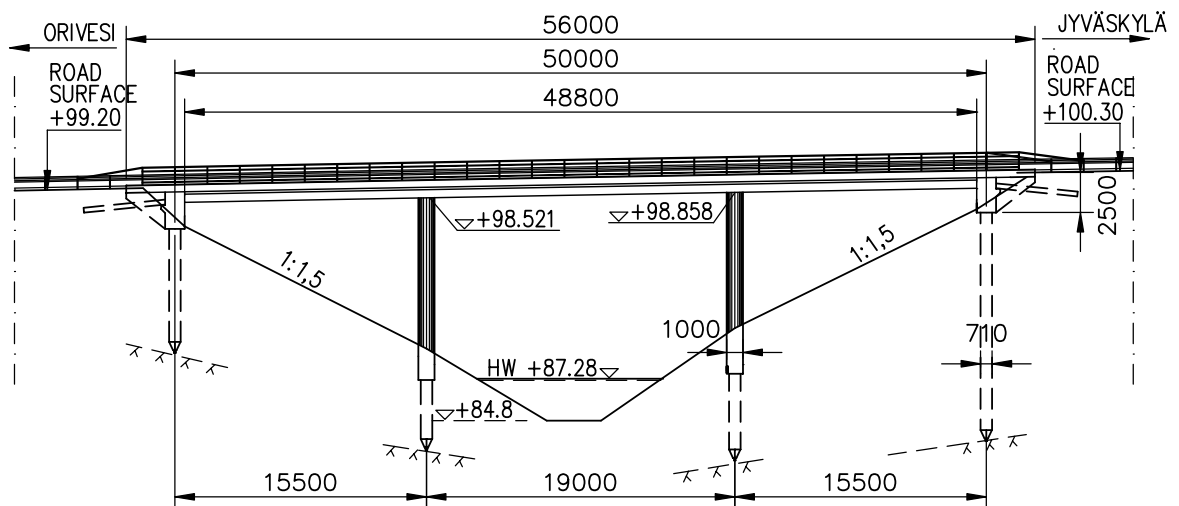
Haavistonjoki Bridge on Highway number 9 between Tampere and Jyväskylä. Side view. The transition slab is within the embankment. The support labels beginning from the Orivesi or western end were T1–T4 (Laaksonen 2004).
